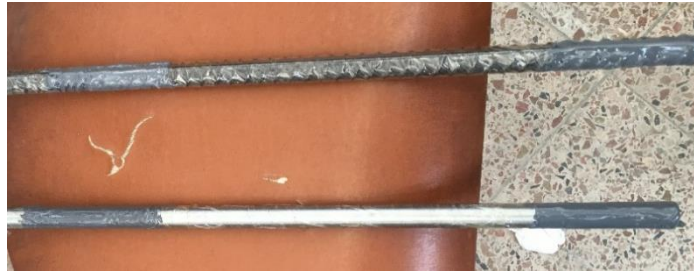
Deformed and plane bars after application of non-corrosive epoxy
